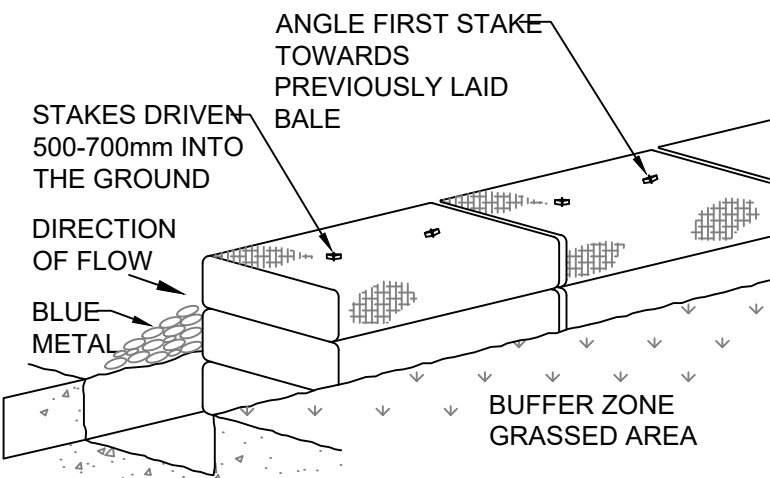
DETAIL - BLUE METAL GROYPNE (SAUSAGE)
